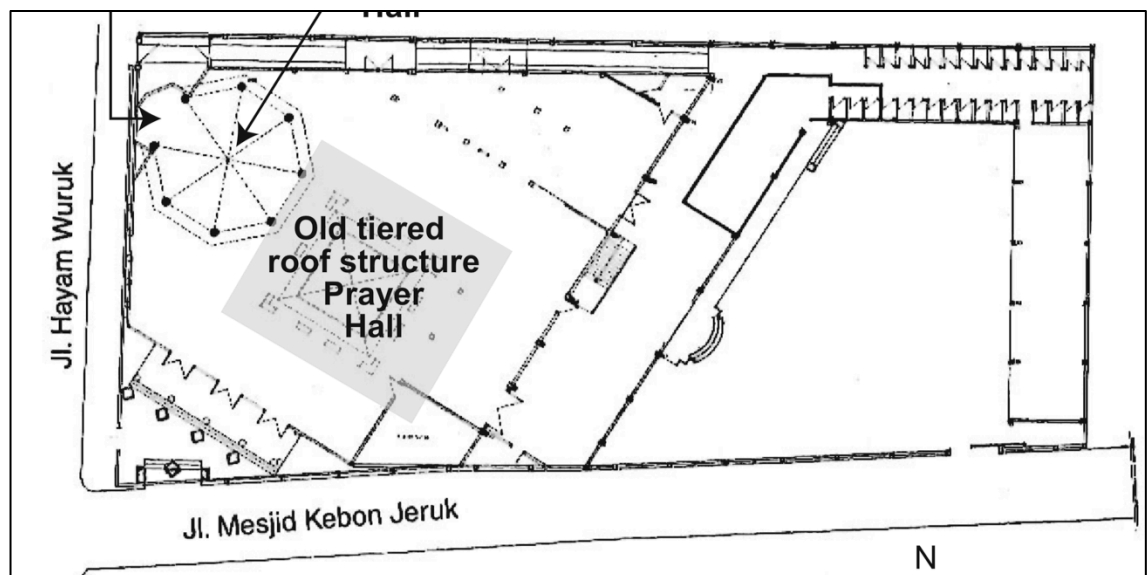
Floor plan of Masjid Kebon Jeruk
